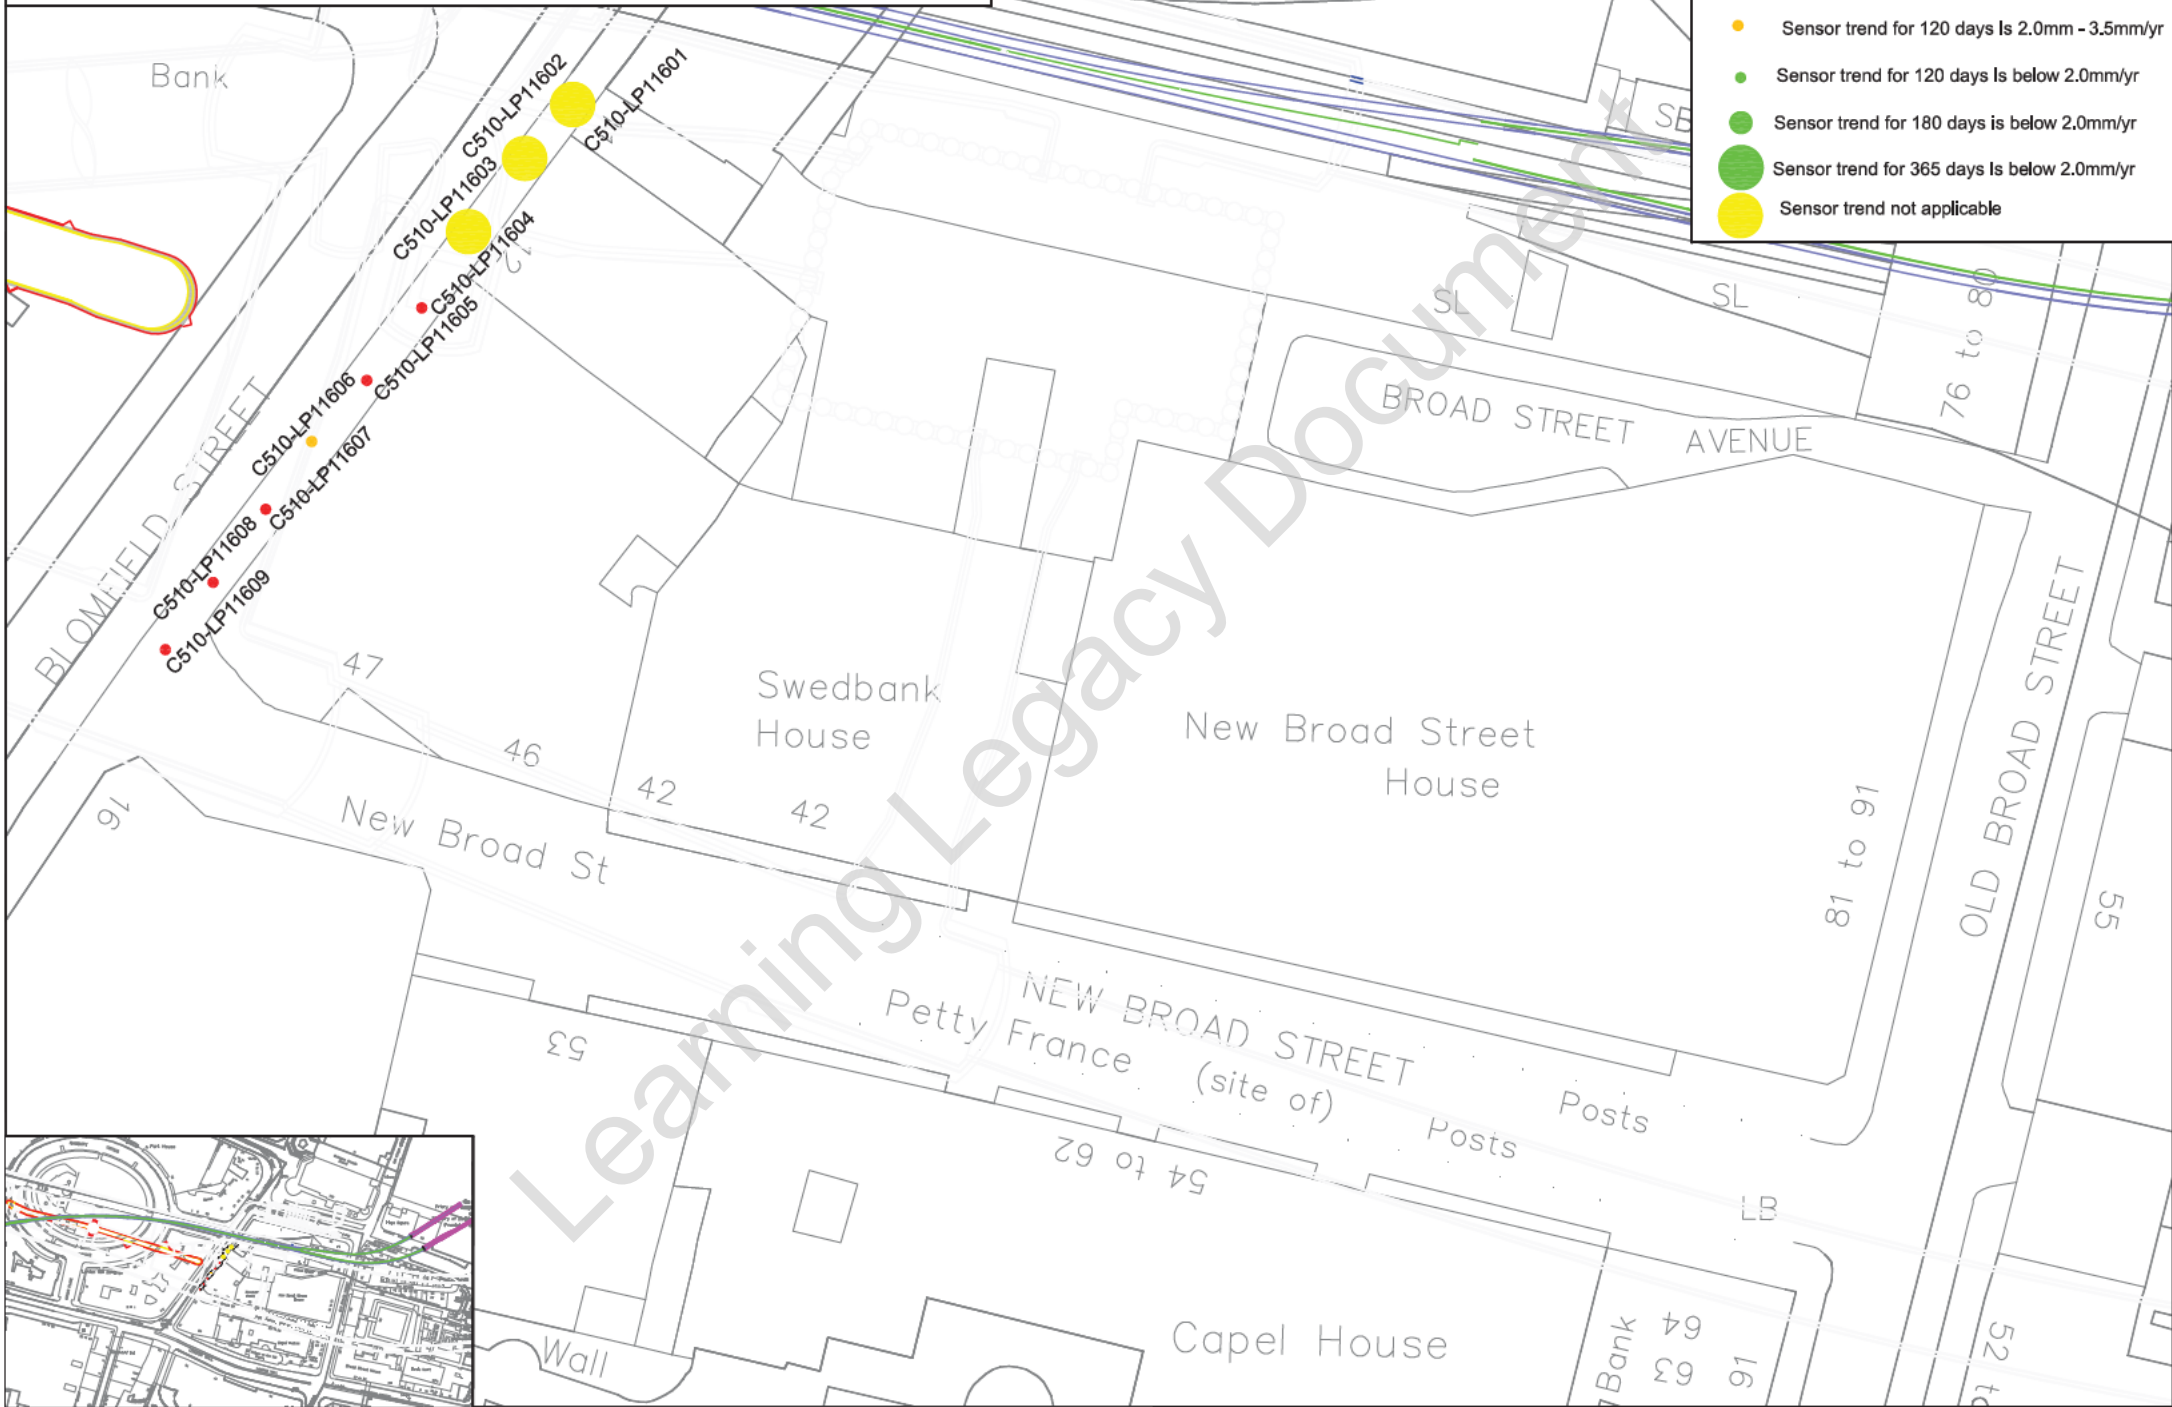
TB Monitoring Sensor Decommissioning Status and Location Plan
